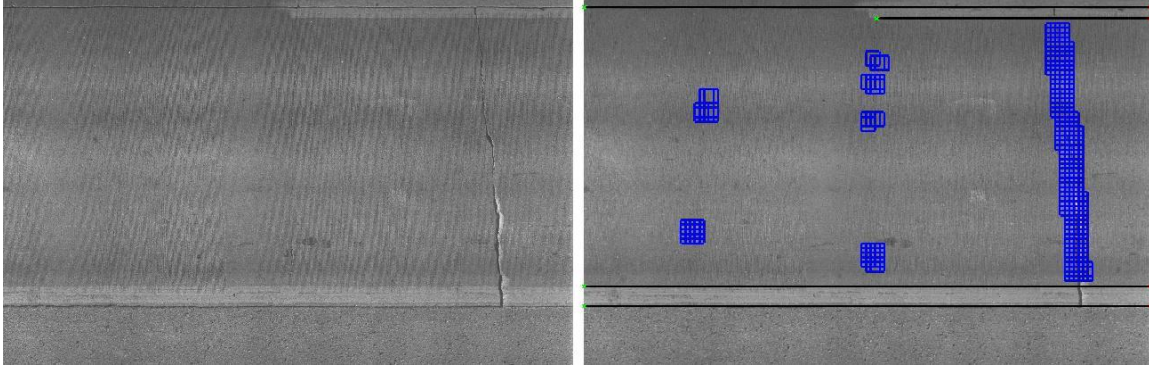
Example 2 of low-severity concrete crack: raw crack (left) and crack detection (right)
